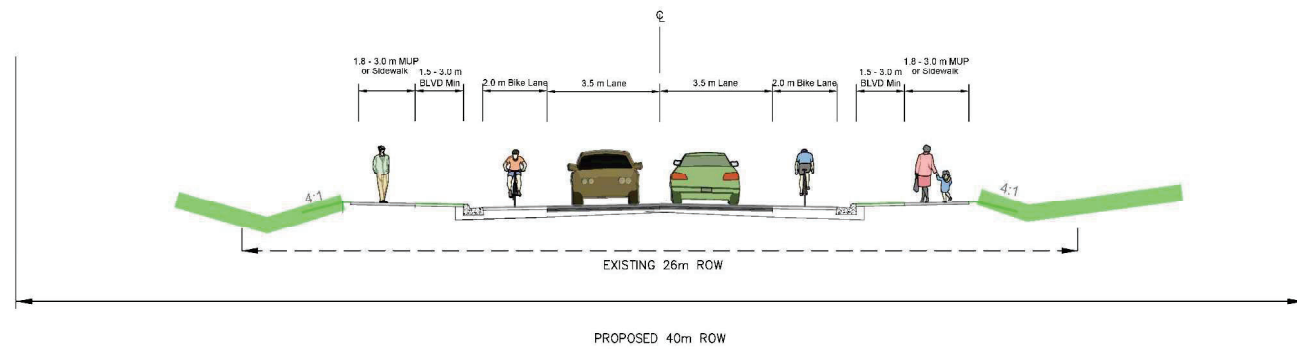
Section 1 Alternative 1 - 2-Lane Urban Cross Section
